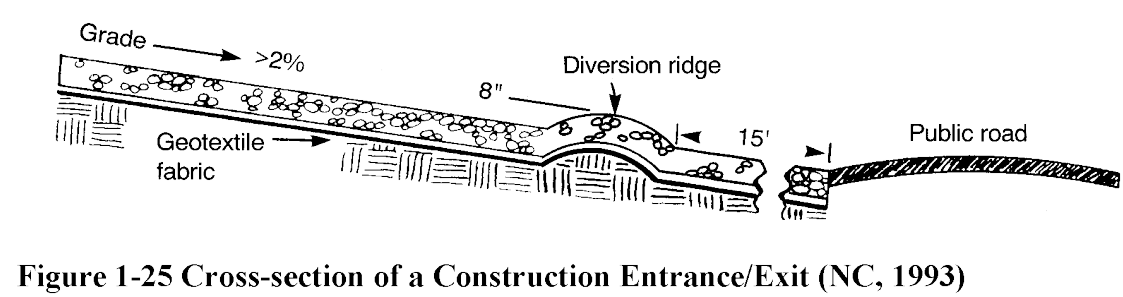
Cross-section of a Construction Entrance/Exit (NC, 1993)
